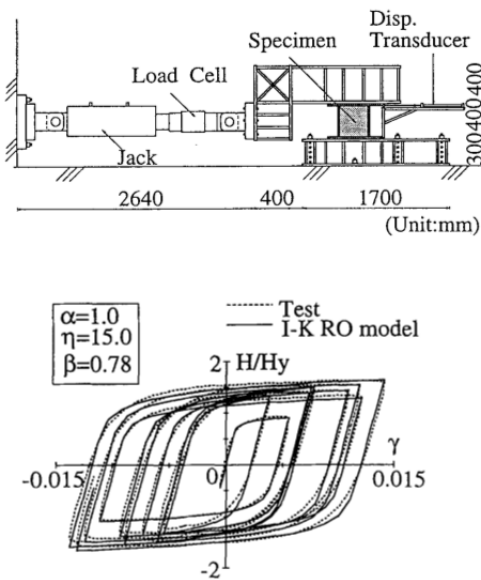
A then new type of steel, named low-yield steel, whose nominal yield stress of 100 MPa, was tested to examine if such steel can be used as a material of hysteretic damper. The steel was used as a steel panel, and its in-plane behavior was tested using a quasi-static loading system (top). The hysteresis loops (bottom) exhibit very conspicuous isotropic-type strain hardening. Later, we developed a hysteresis model that can simulate such behavior.
